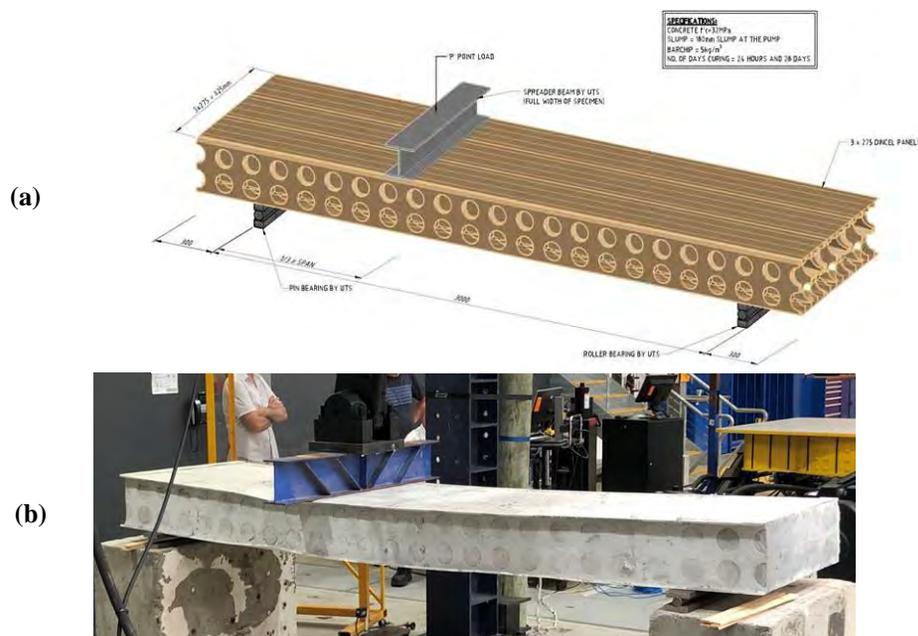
a) Dimensions of the test specimens, b) Overall view of the test specimens
